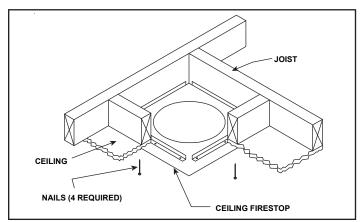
Ceiling Firestop (Ceiling Side)
